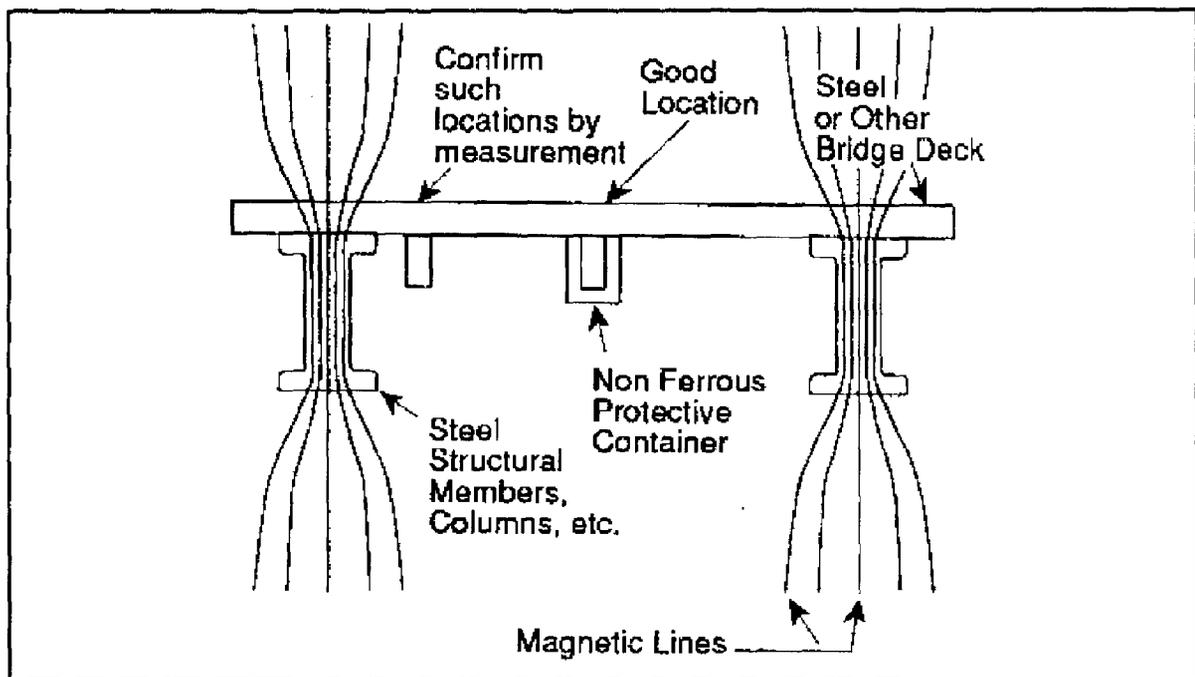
Typical Bridge Deck Installation for Magnetometer. ⁽⁴⁾
